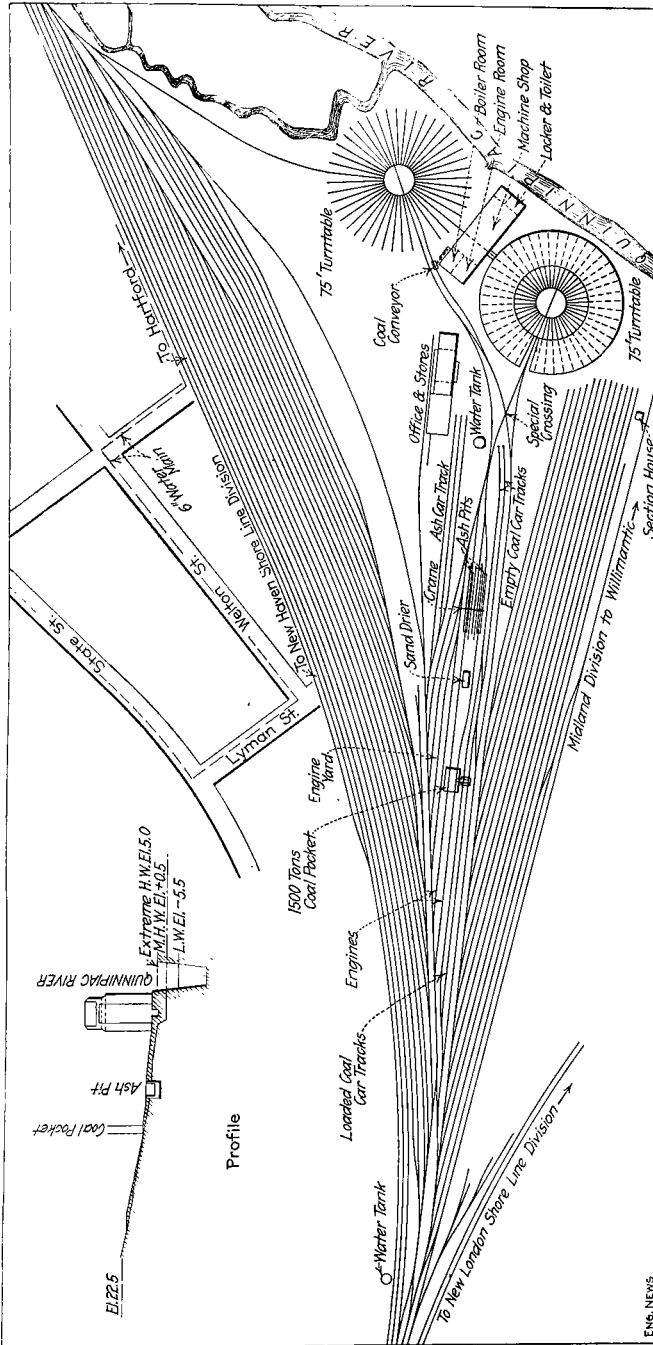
GENERAL ARRANGEMENT OF CEDAR HILL ENGINE HOUSE FACILITIES.
